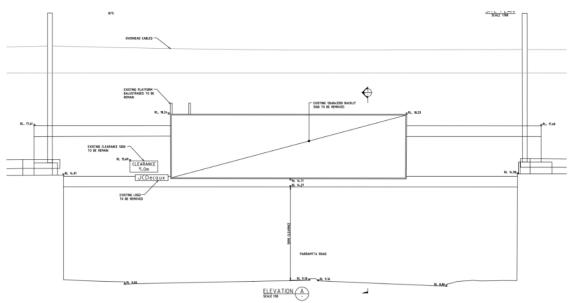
Existing sign architectural plan (Source: Dennis Blunt Consulting Engineers)
